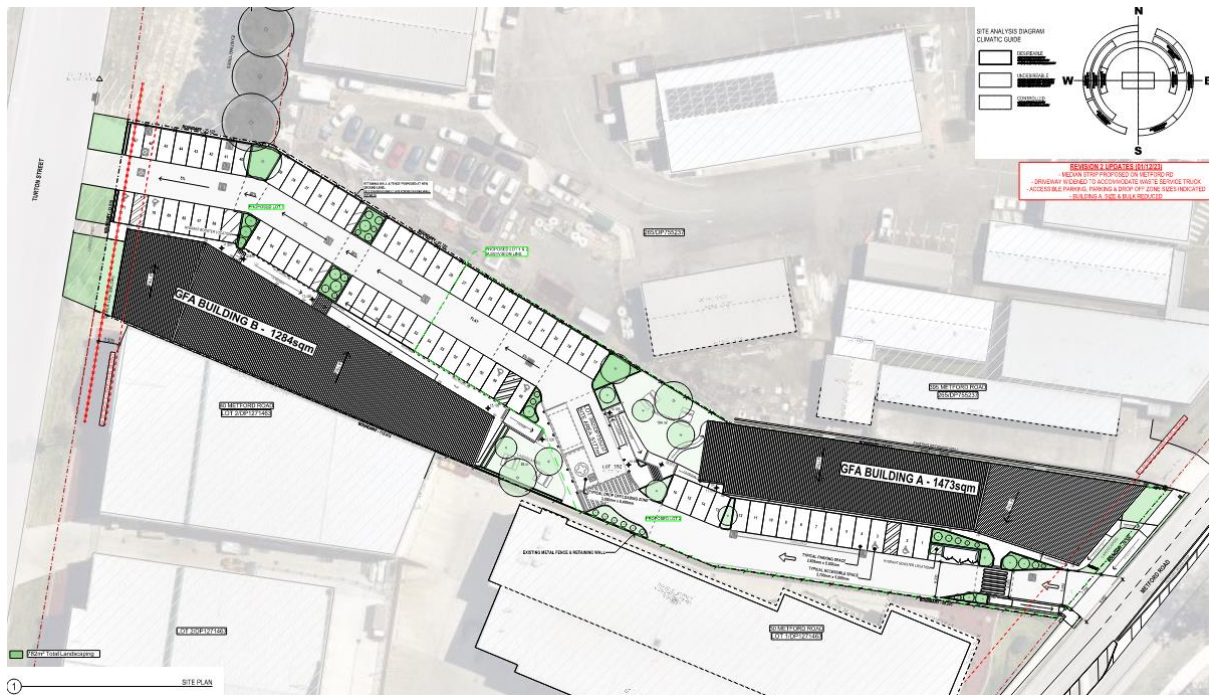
Proposed site plan (source: EJE Architects, 01/12/2023)
